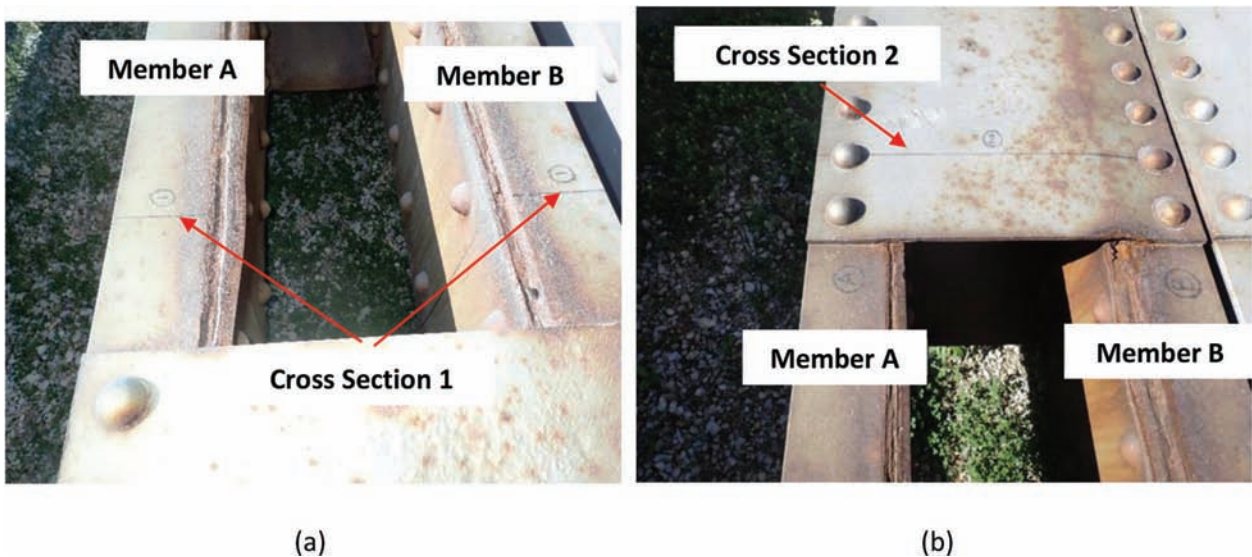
Truss chord at (a) Cross Section 1 and (b) Cross Section 2.
